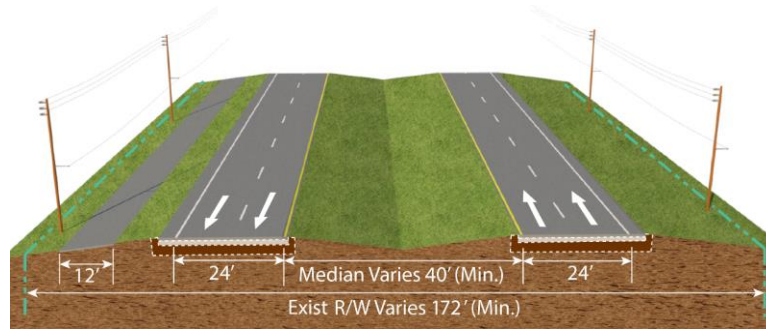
Existing Roadway Typical Section – Segment 1 – 4th St. to west end of Gandy bridges
